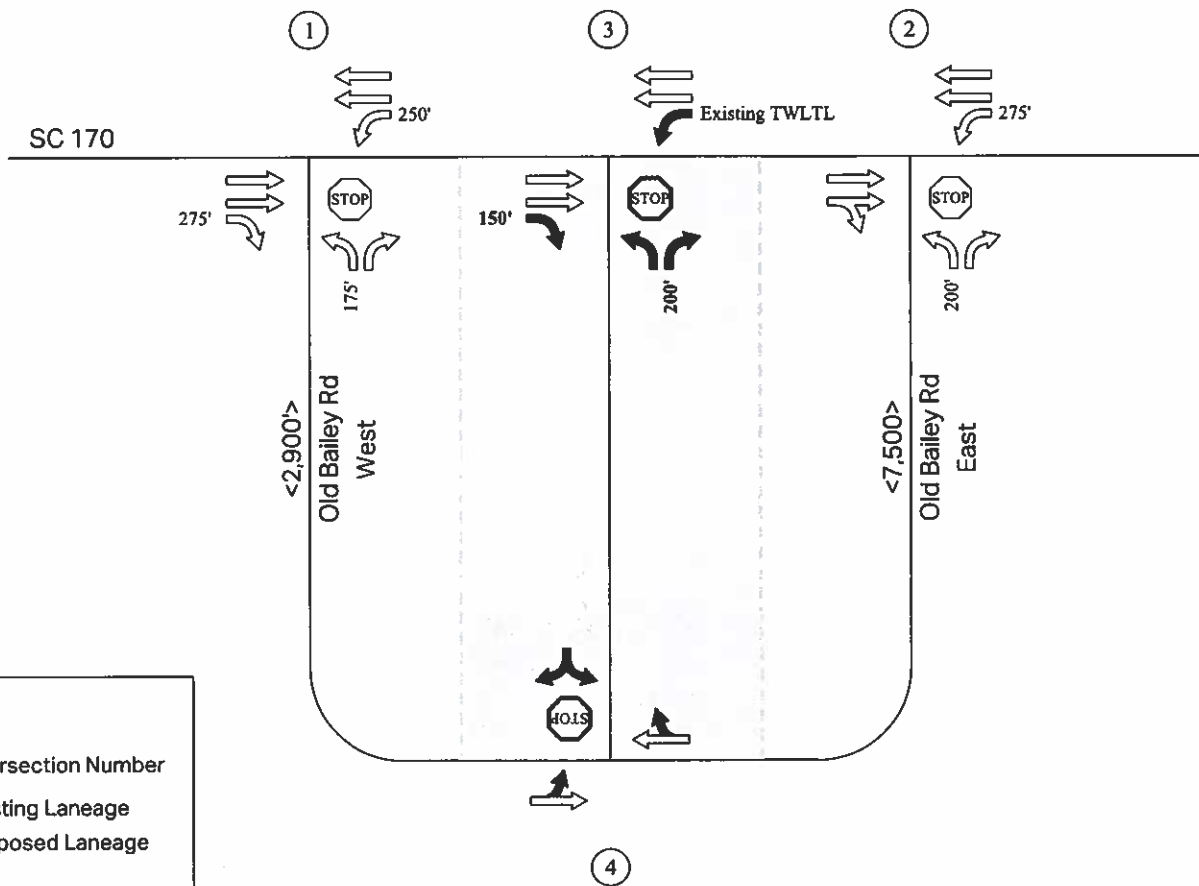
shows the proposed Build 2027 proposed laneage and Figure 12 shows the Build 2027 AM and PM peak hour volumes and LOS. As indicated in the tables, the northbound approaches at intersections #1 (Old Bailey Road West) and #3 (Site Driveway #1) with SC 170 are expected experience significant delay and queuing. It should be noted that the volume to capacity ratio is less than 1.0 at the Old Bailey Road West intersection and not likely to warrant a traffic signal.
